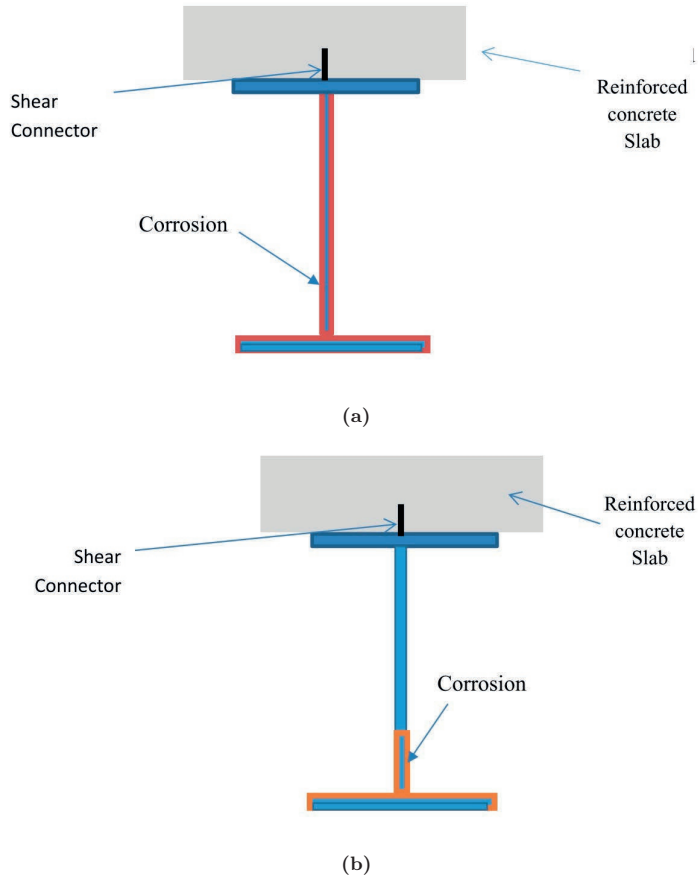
Corrosion models for (a) supports (shear section model) and, (b) the mid-span (moment section model) of a steel bridge girder [7].
